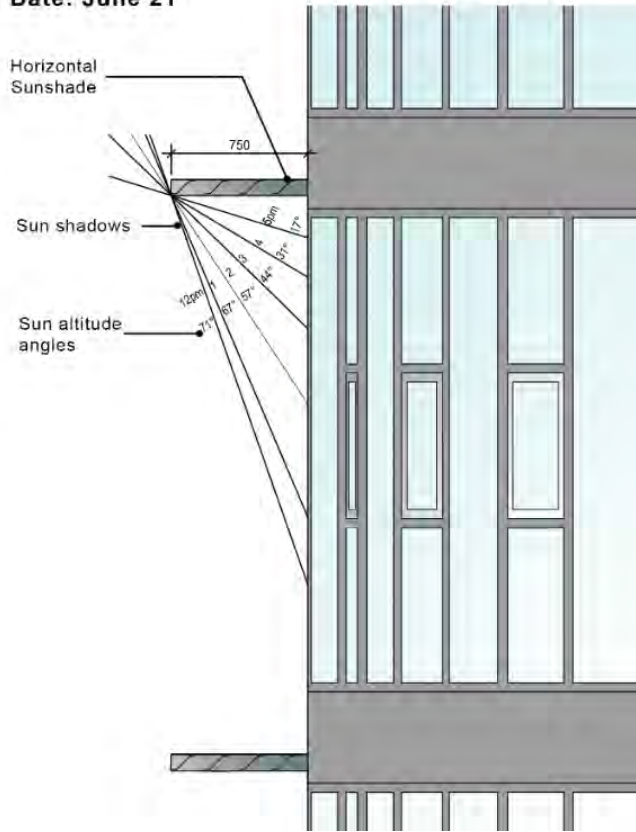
Section of west facade showing depths of shadow angles from horizontal shading installed currently at Velaanaage
